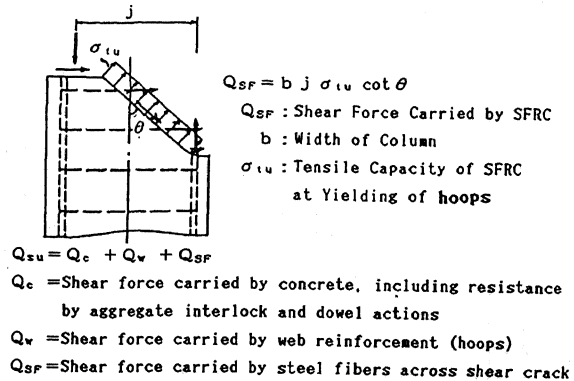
Shear Resistant Elements at Shear Crack in Reinforced Concrete Columns with Steel Fibers
